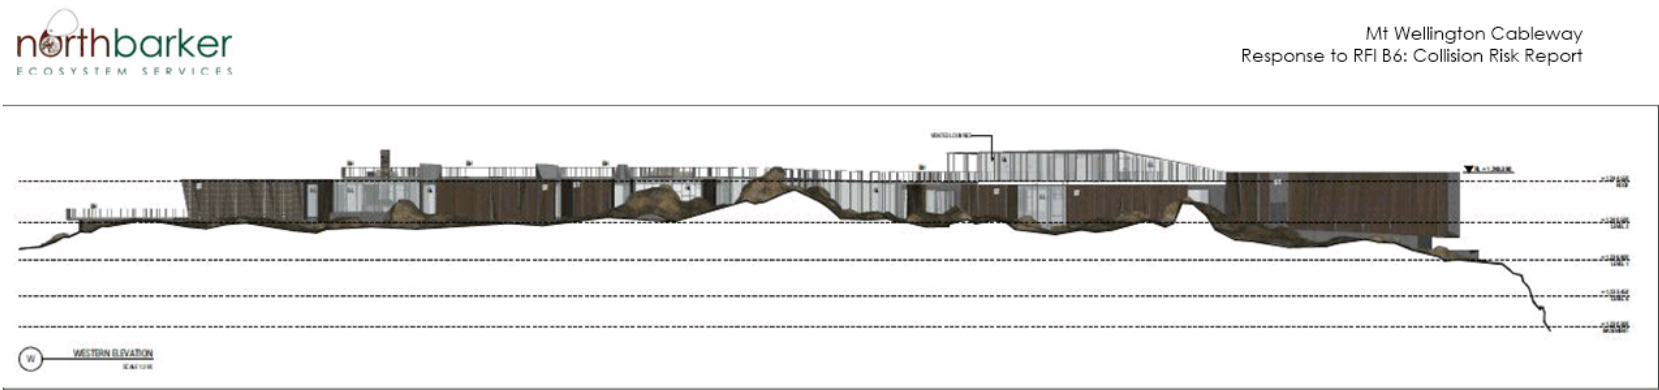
Building design from perspective of western elevation, showing north and south sections of the building, the adjoining enclosed glass walkway, and the proposed obstructions on eastern face windows that may have posed a reflective risk
